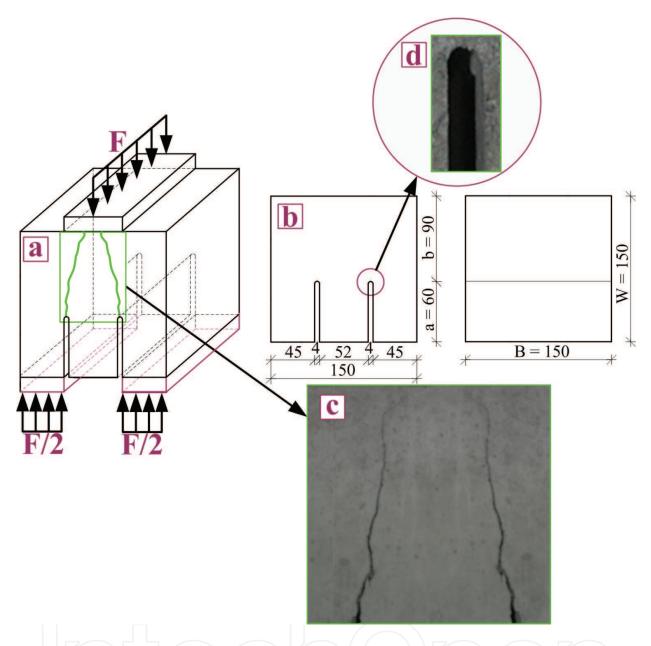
Specimen with (a) loading conditions, (b) dimensions (in mm), (c) exemplary crack path, and (d) blunted notch.
